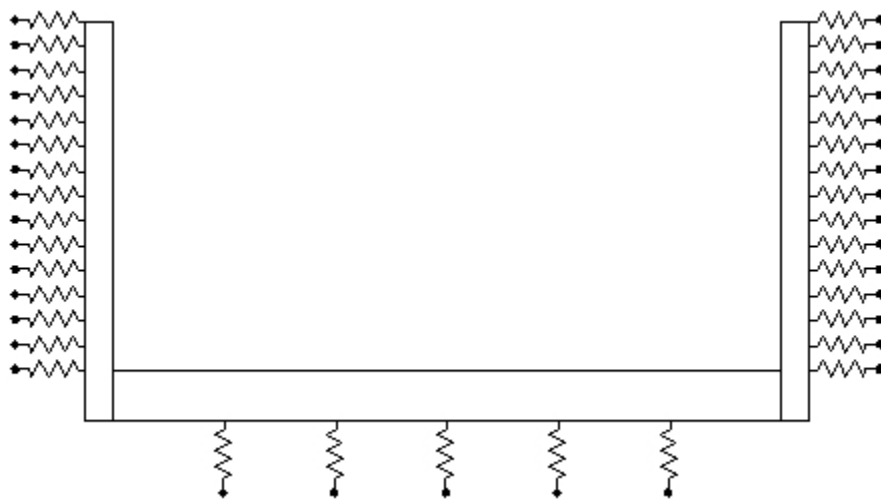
Schematic of retaining structure with soil-structure-spring connections.
